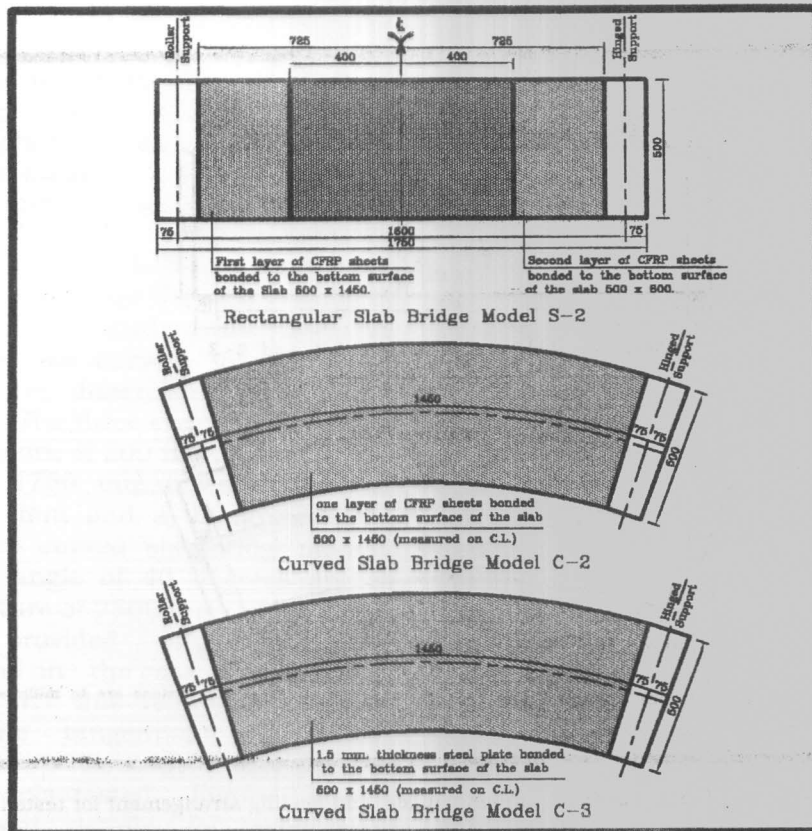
Upgrading techniques used for tested slab bridge models S-2, C-2, and C-3.
